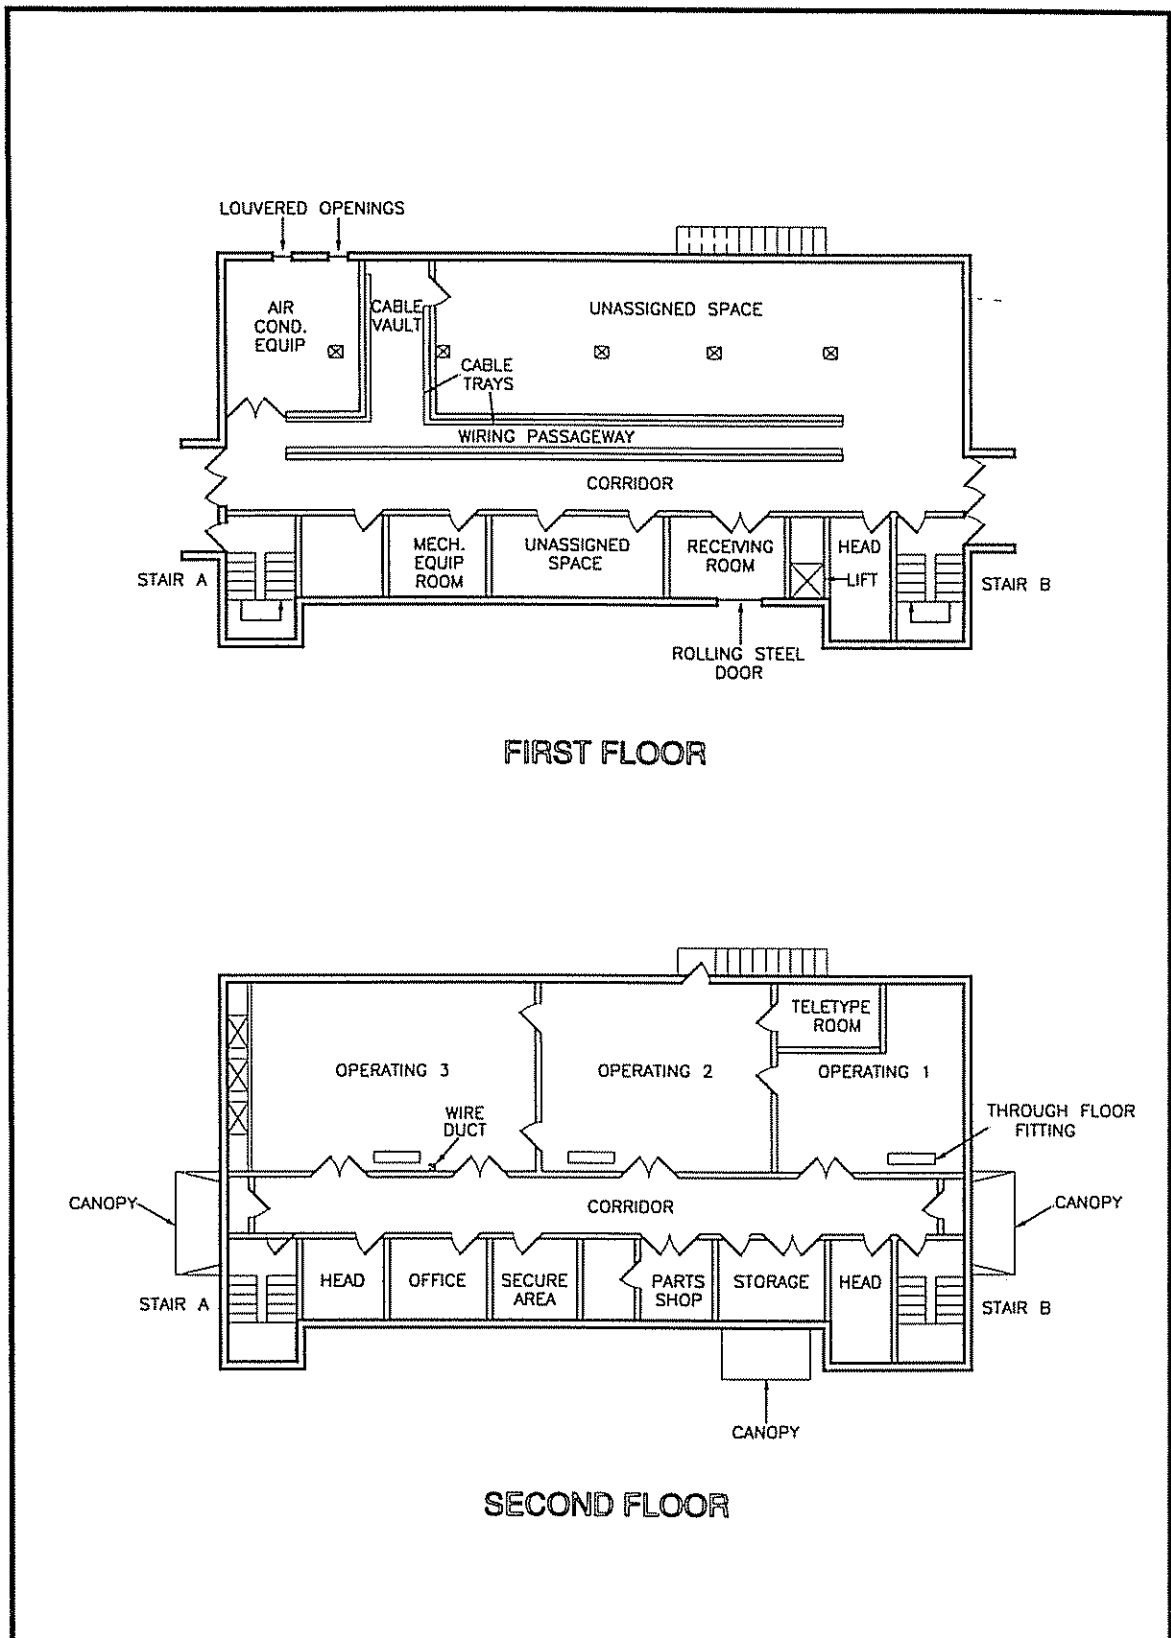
Above and below: First and second floor plans of radio receiver building (Building 14) at the Naval Radio Station (R) Northwest, Virginia.
